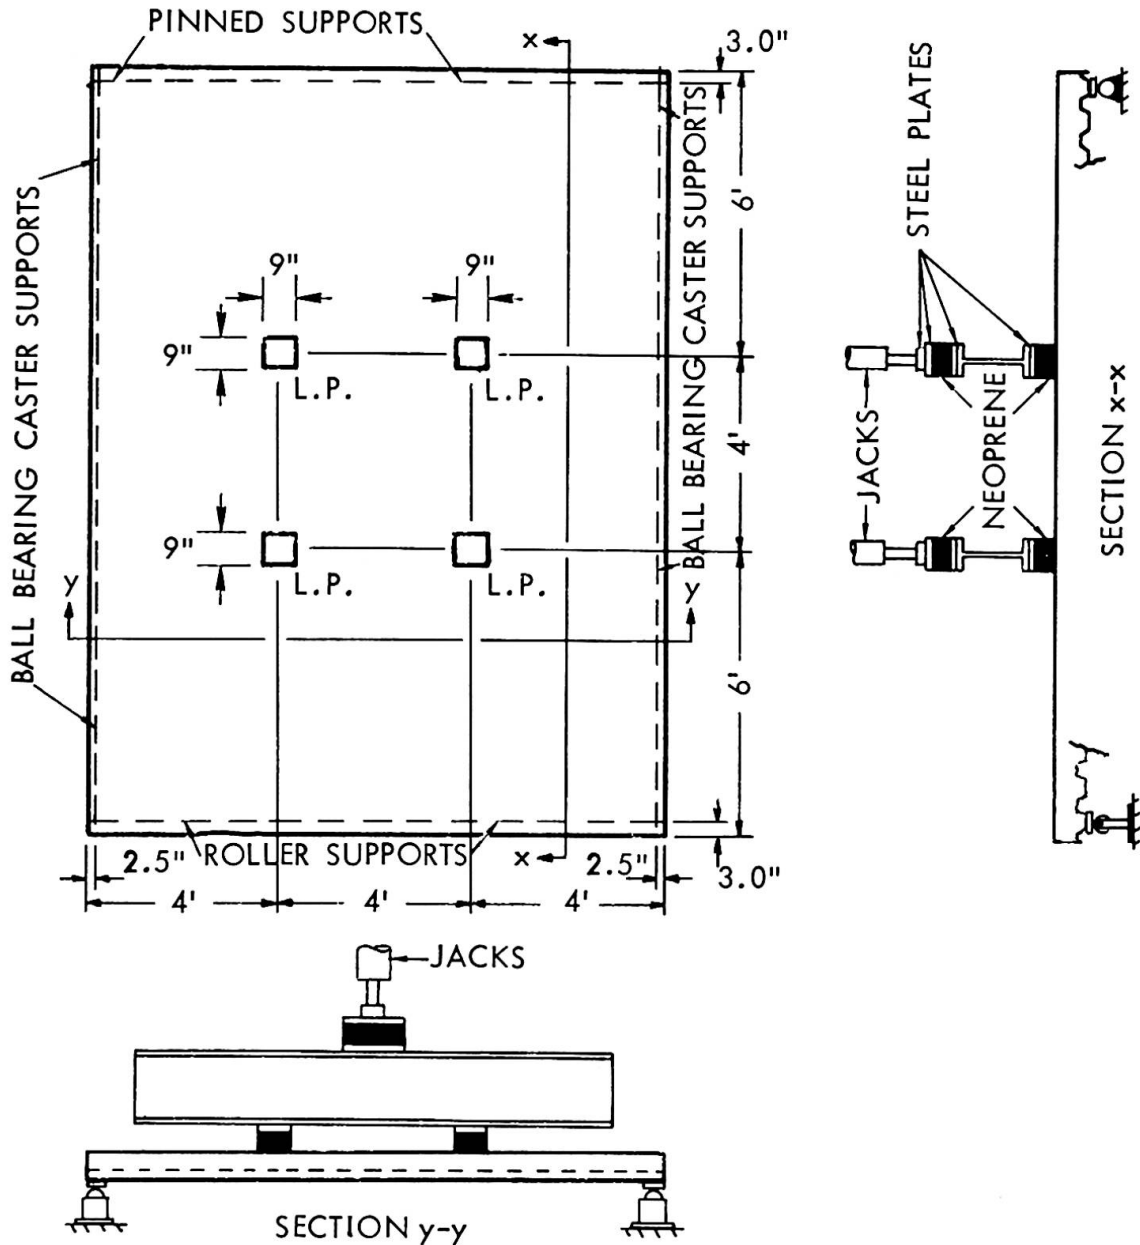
General layout of full-scale slab tests indicating positions of the load points and positions of the support reactions.
